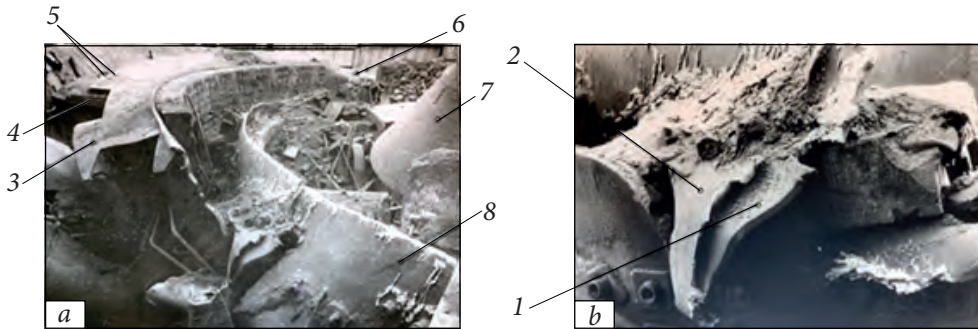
General view of the metal structures of BF No. 7 during the dismantling of the lower part of the furnace: 1 — location of the boshes destruction due to the falling of the stamp; 2 — furnace column heads; 3 — boshes casing; 4 — boshes coolers; 5 — shaft casing; 6 — remnants of the internal part of the deck ring (marator) with cutouts for metal condition analysis; 7 — ring air duct; 8 — small cone, removed during furnace dismantling
